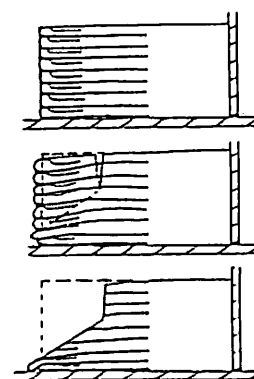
Result of typical centrifuge test showing the sequence of failure for intermediate reinforced clay wall (Series I models) (Goodings, 1989).
